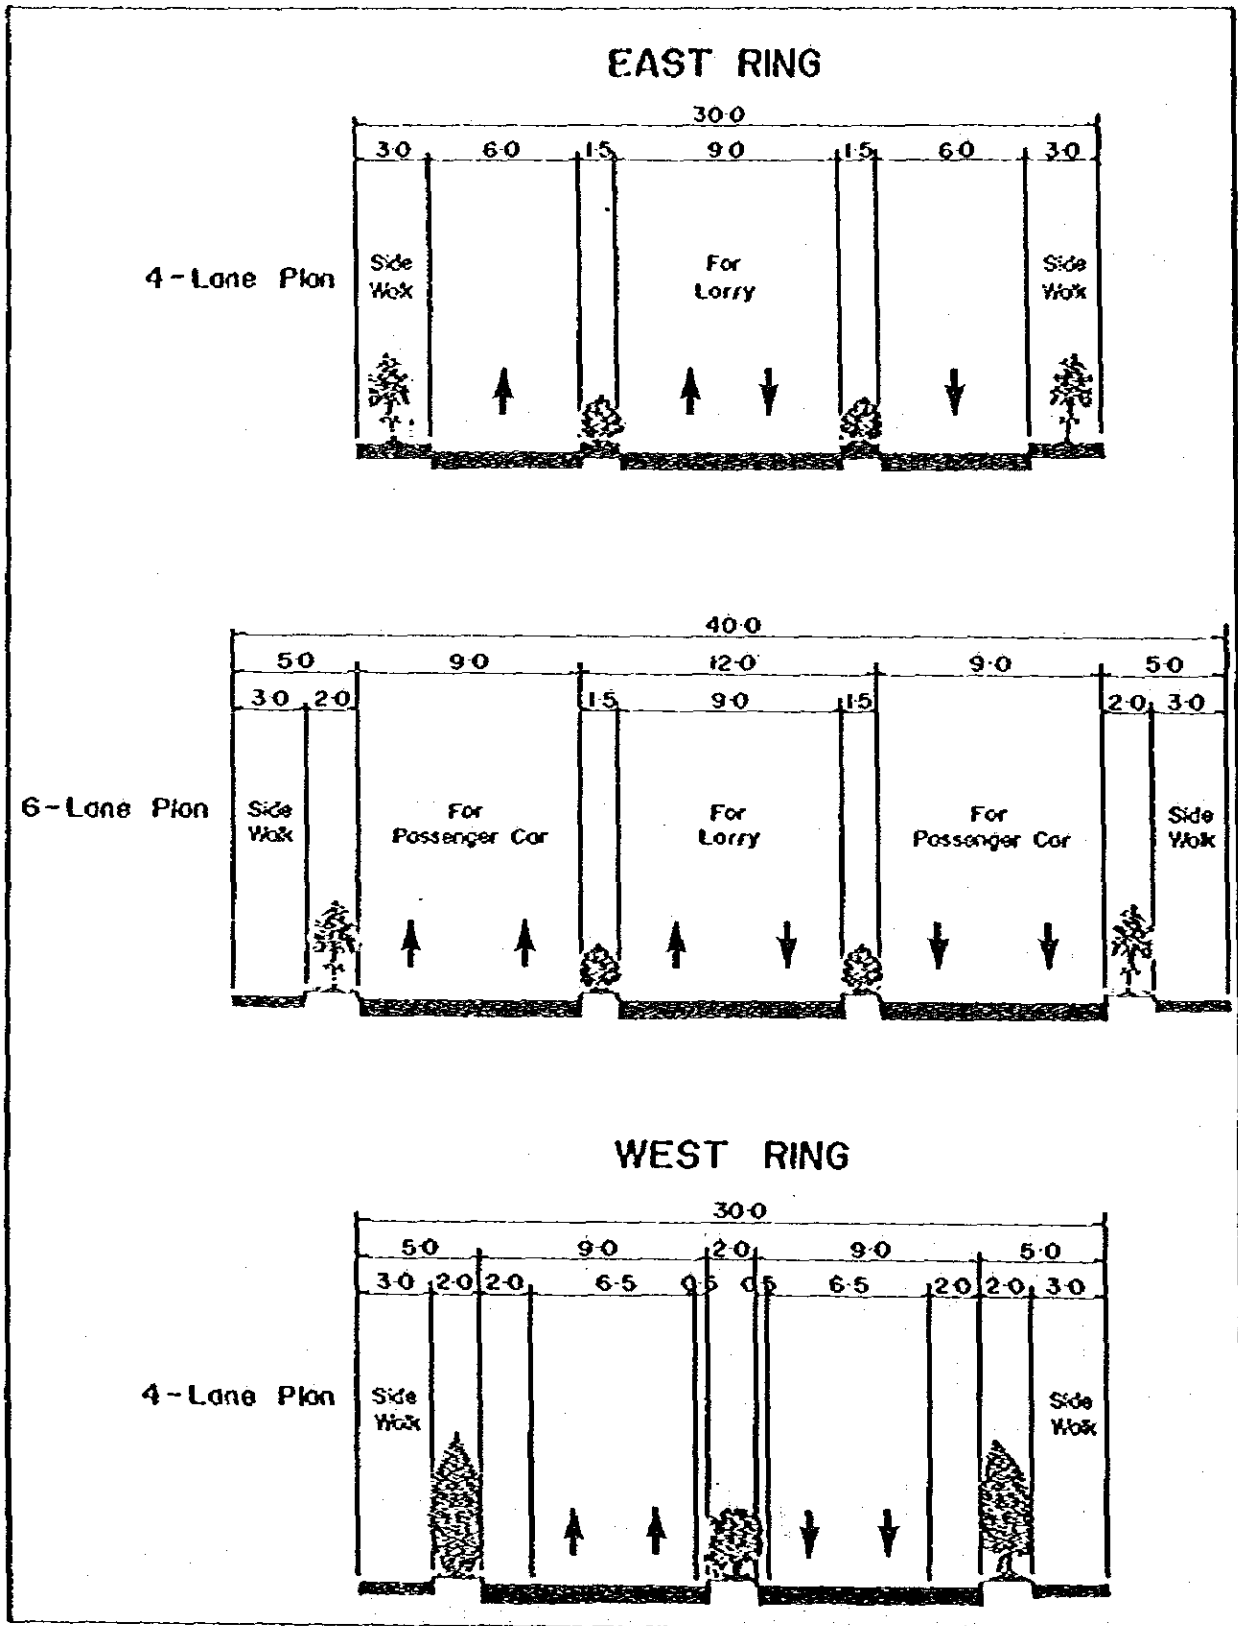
ALTERNATIVE CROSS SECTIONS EAST RING/WEST RING
